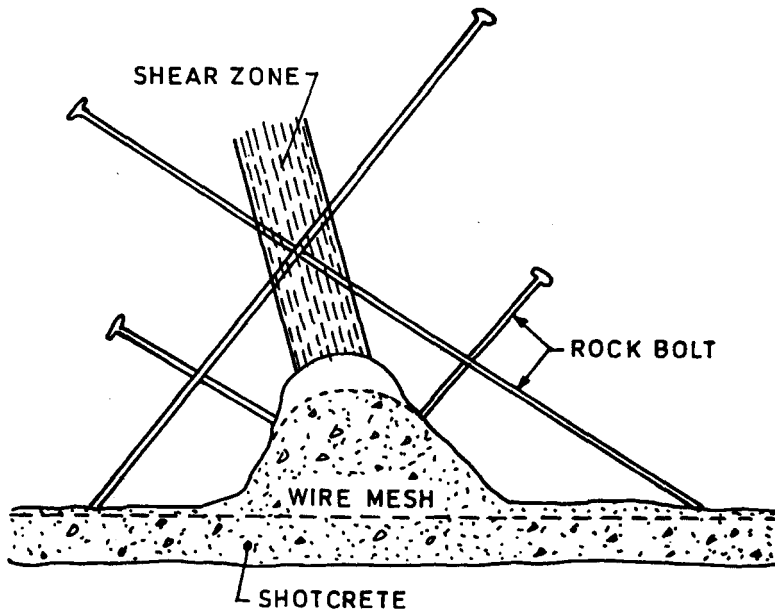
TYPICAL TREATMENT OF A NARROW SHEAR ZONE
